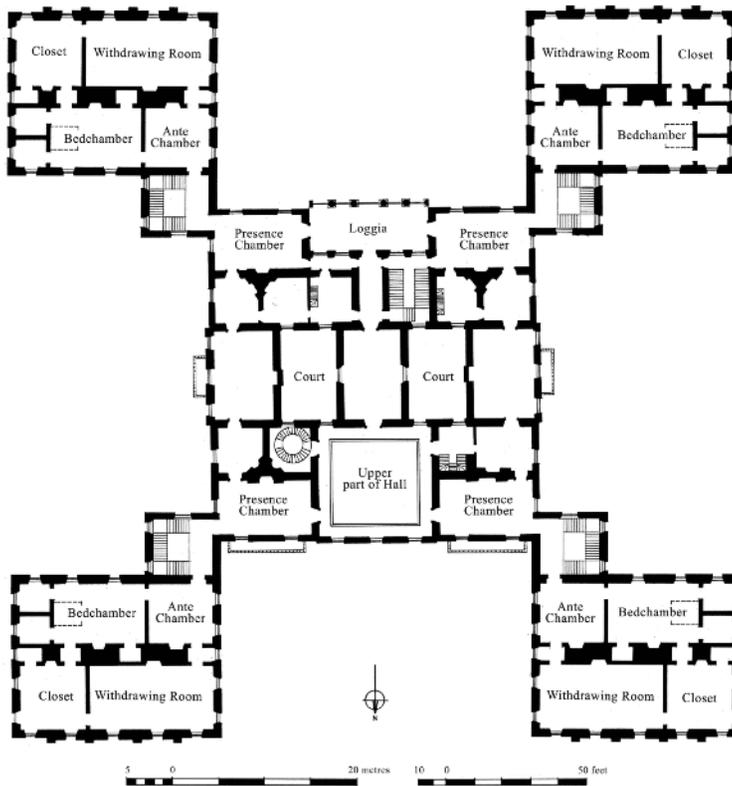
Reconstruction of the first floor plan of the Queen's House in Greenwich as proposed and started by John Webb in early 1662.
